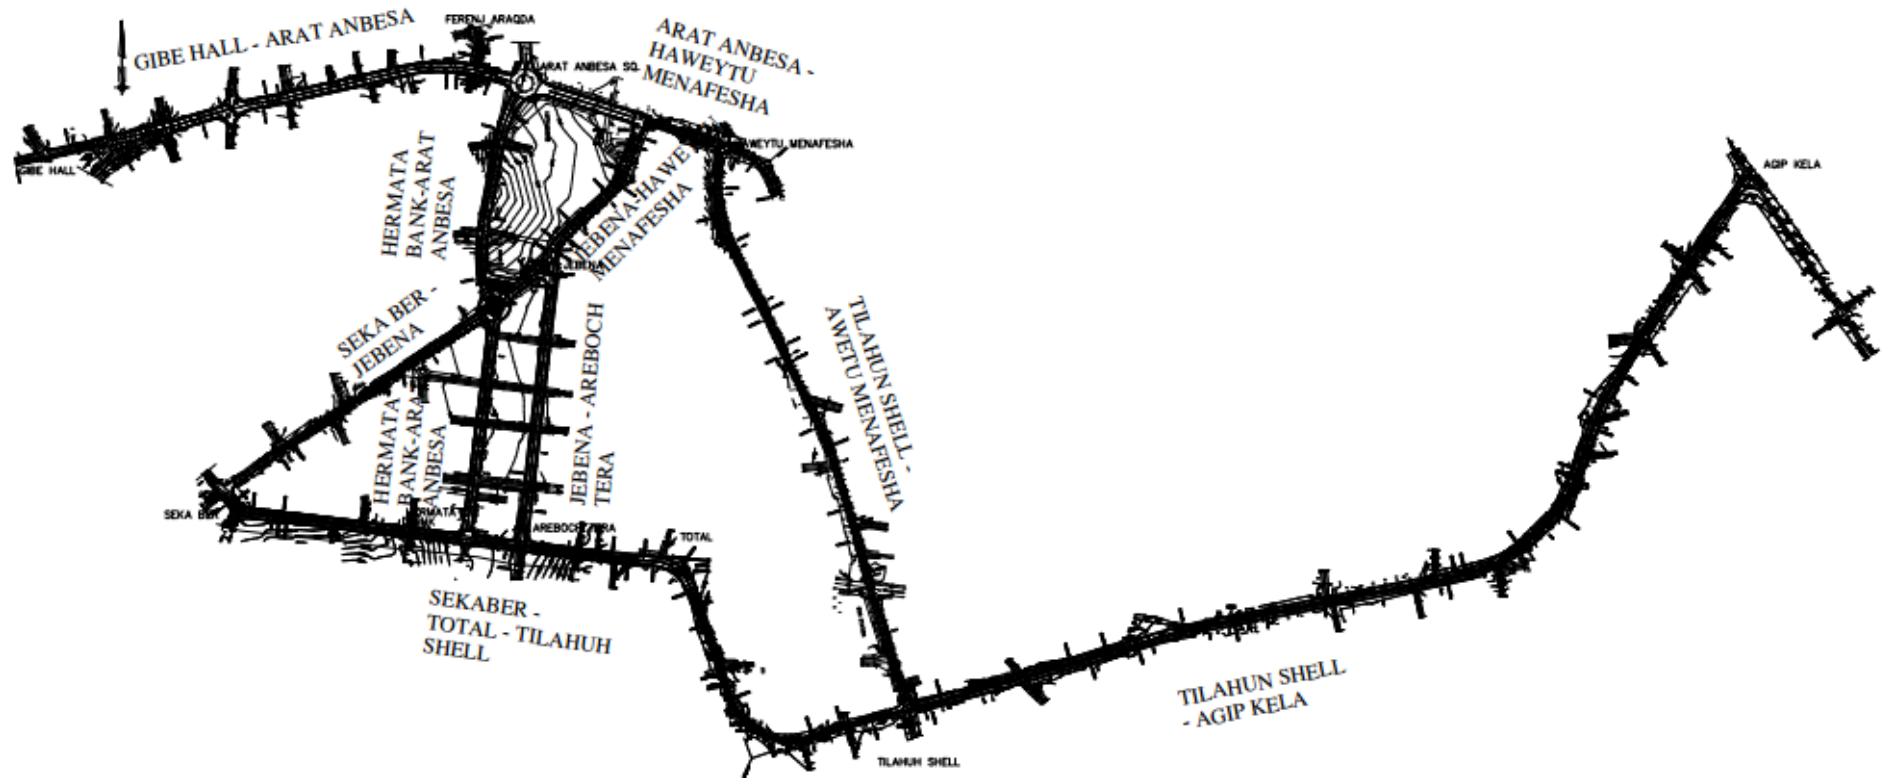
Plan of the Selected Routes in Jimma Town Asphalt Project
